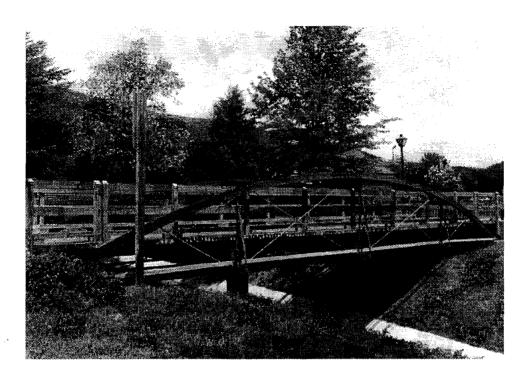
Pony Bowstring Arch Truss Built in 1878. Now at Ironto Wayside, Montgomery County.
